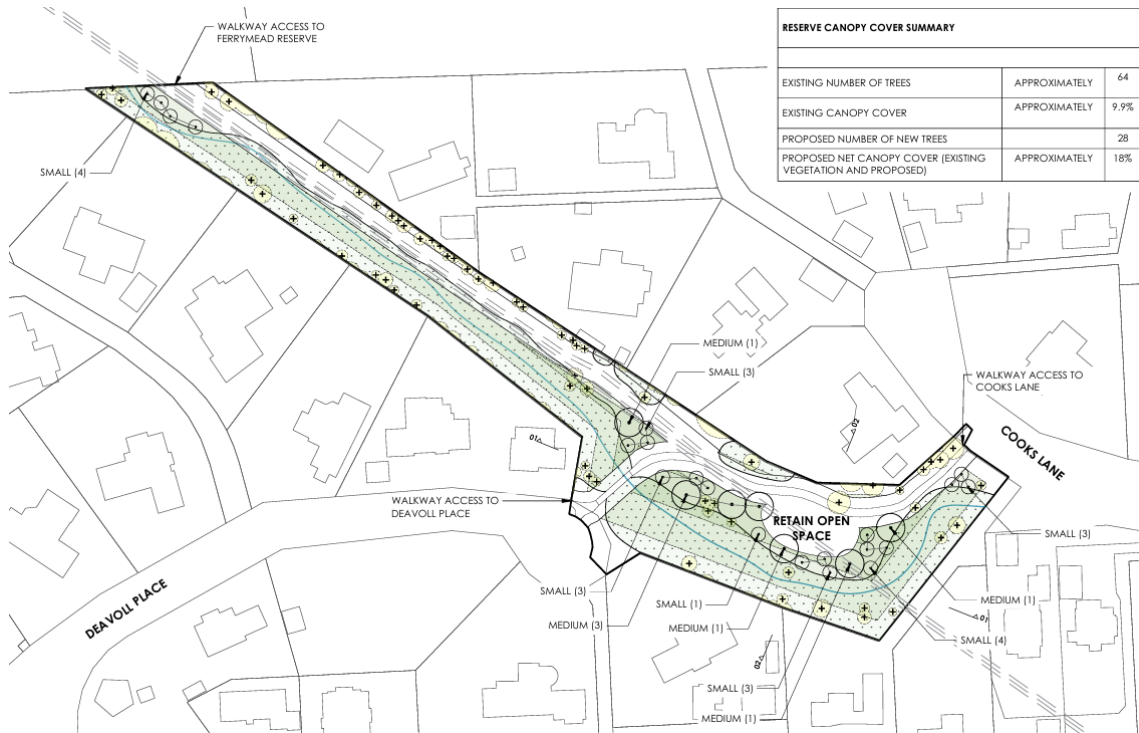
Proposed Cooks Reserve Tree Planting Plan
